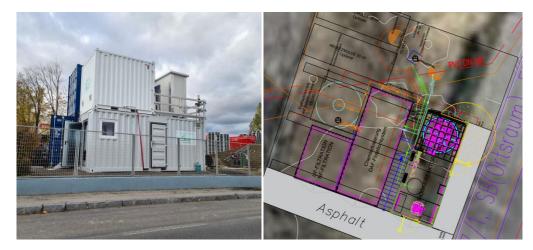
Pilot plant of the Austrian EcoSite installed in its final location at the facilities of the partner BER.
